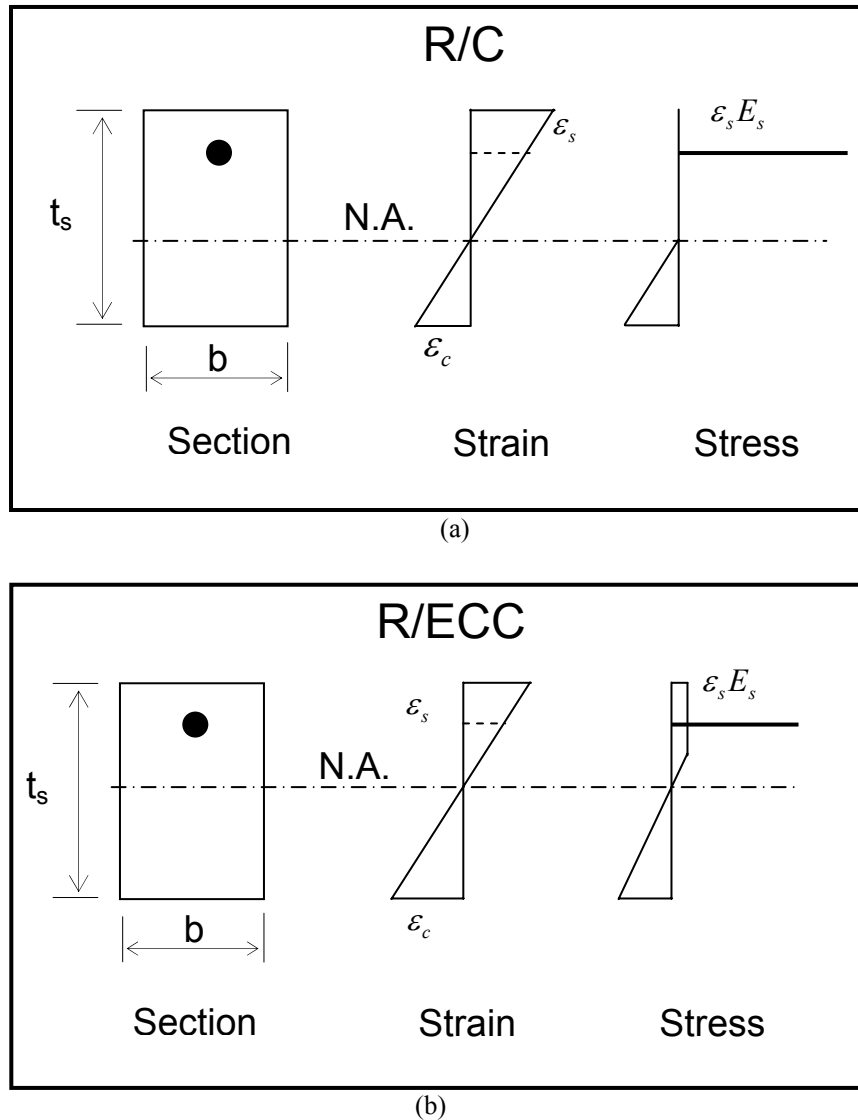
Schematic Stress and Strain Distributions in a Cross Section of (a) Reinforced Concrete (R/C) and (b) Reinforced ECC (R/ECC) Link Slab
